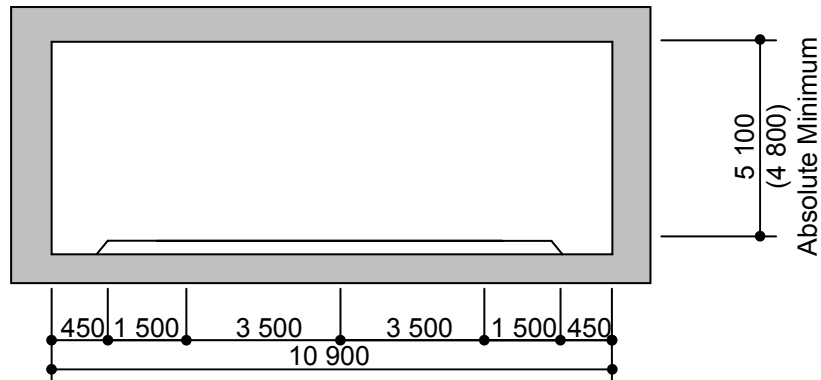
Arrangement of Box Culvert for C Class Road
